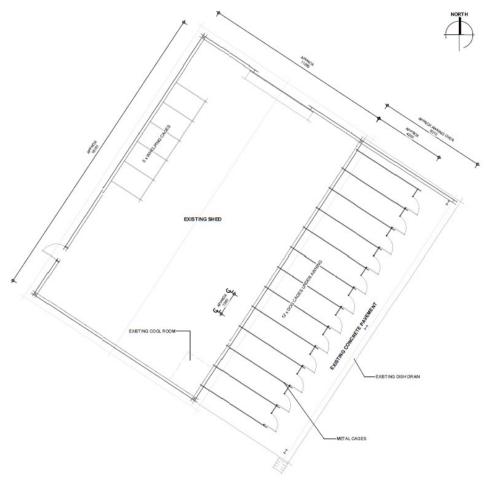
Whelping shed floor plan. Source: Franklin Consulting Australia Pty Limited
